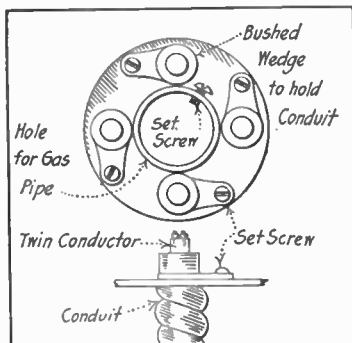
Cast iron outlet plate for flexible-steel conduit or flexible-steel armored cable
